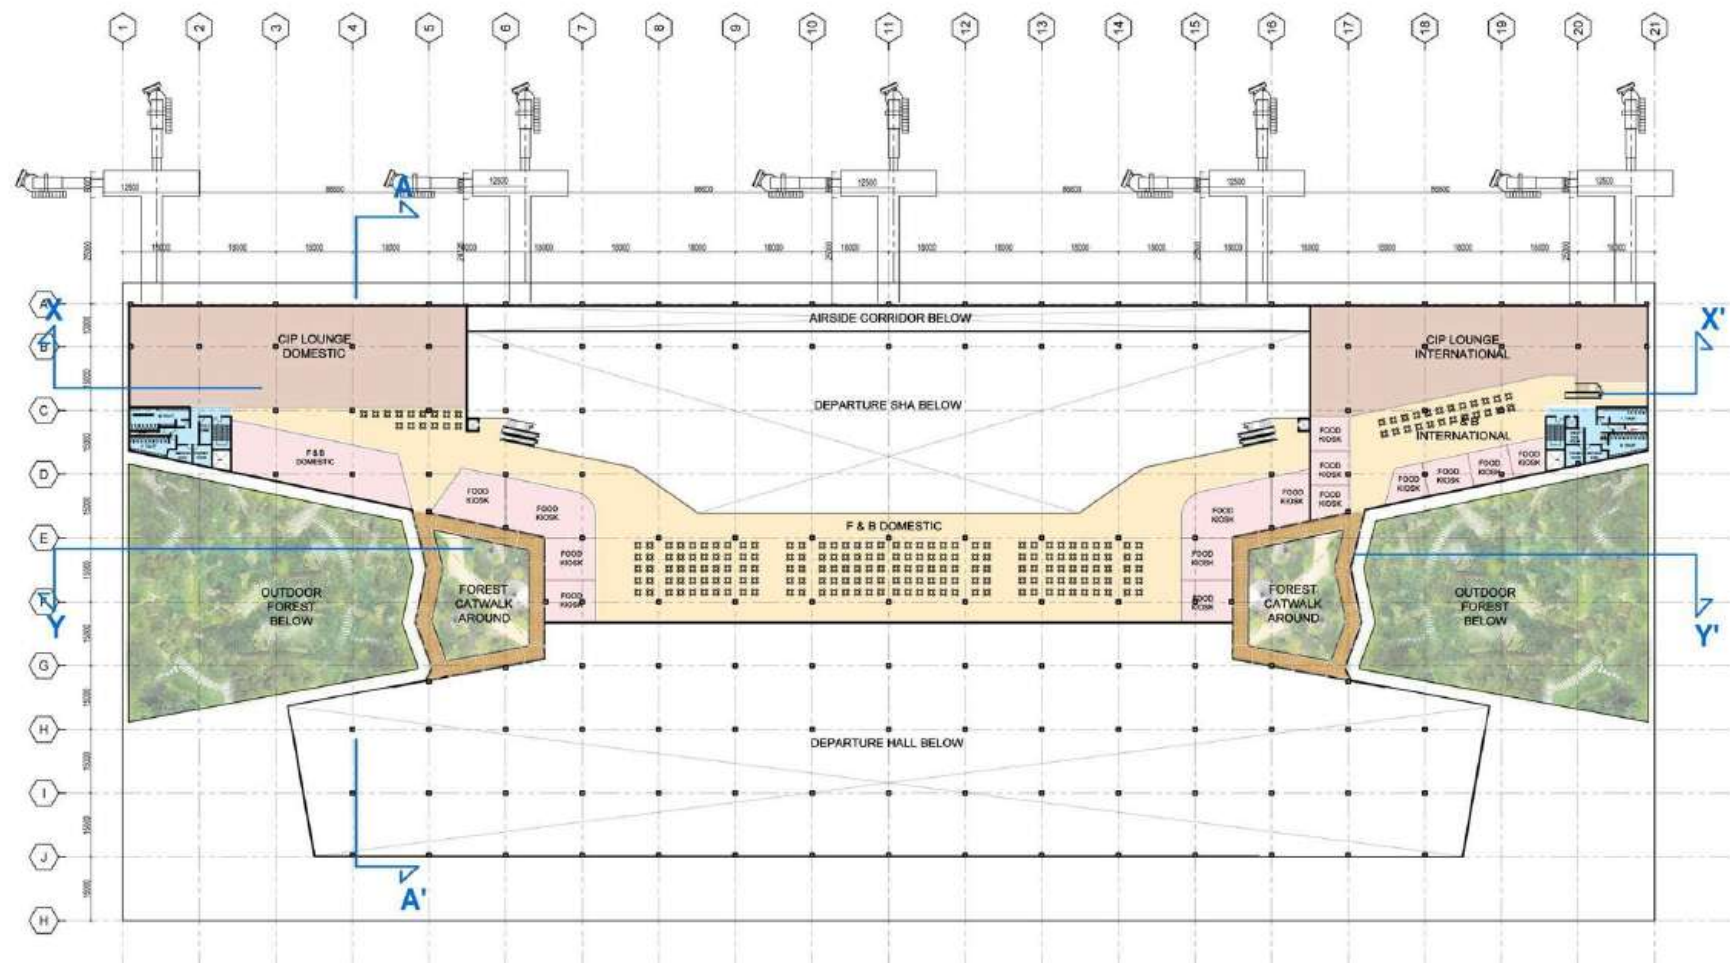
Site Plan for Retail/F&B Departure Side for New Integrated Terminal Building
